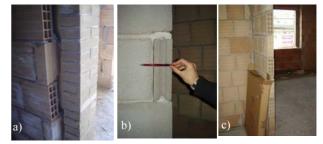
External walls (a), concrete blocks (b), internal partitions (c)
